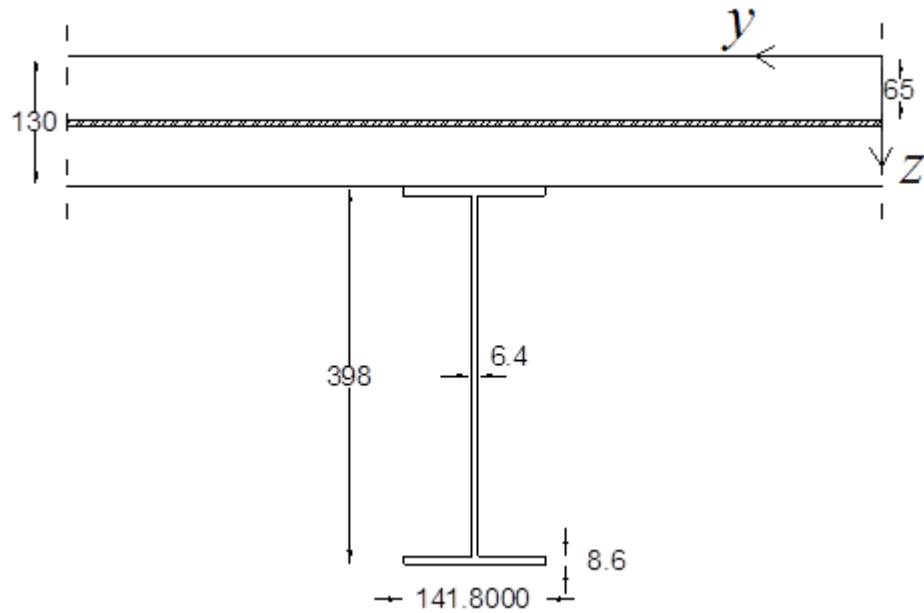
Slab-beam cross section; beam Section (UKB 406x140x39)
